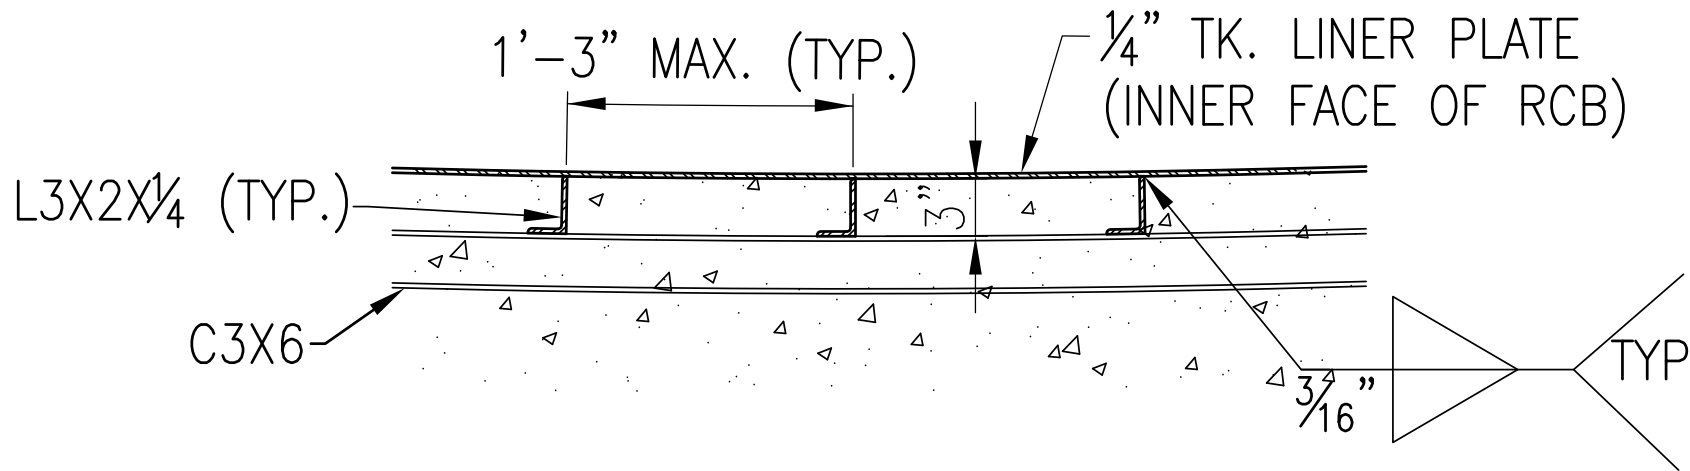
E.1.1-1—Elevation View RCB Liner Plate and Anchorage System
